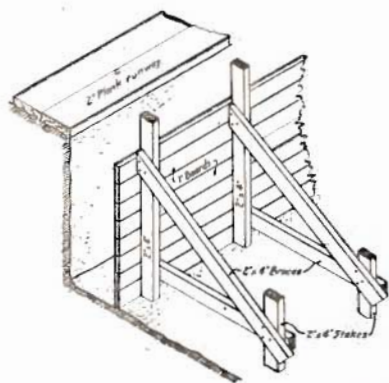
Forms for the foundation walls where the embankment serves as other form.
